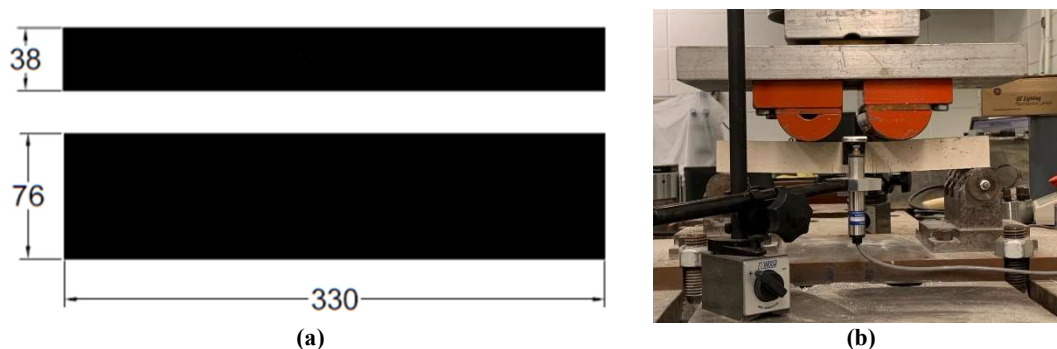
Flexural performance test setup: (a) beam specimen dimensions (in mm) and (b) flexural test setup.
